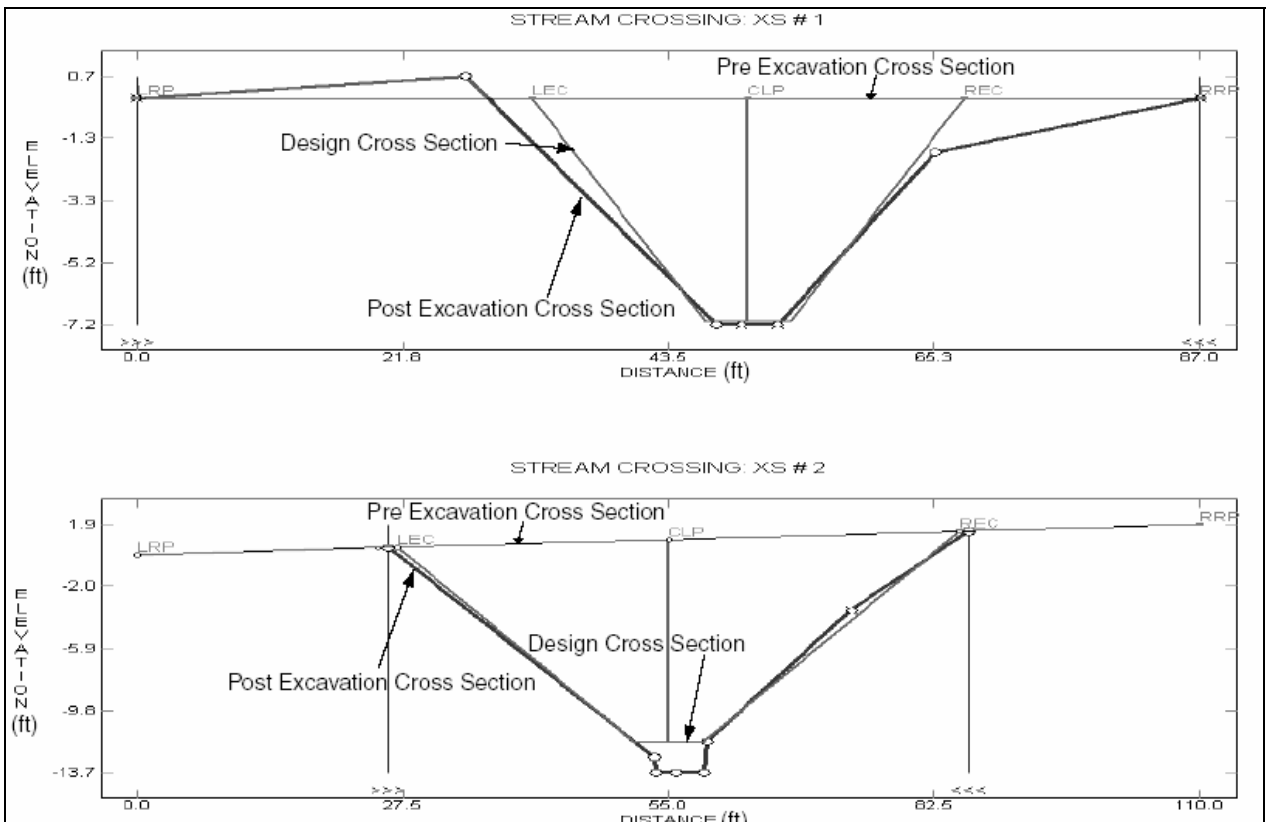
Redwood Creek 1300 Road Site #12 – Stream Crossing Pre & Post Excavation Cross Sections.
